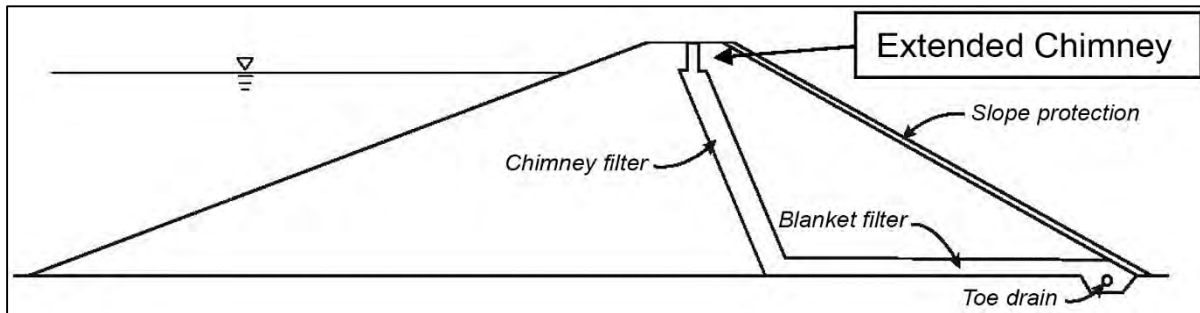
Simple cross section showing a chimney used in a new dam or an old dam with an extended chimney.
